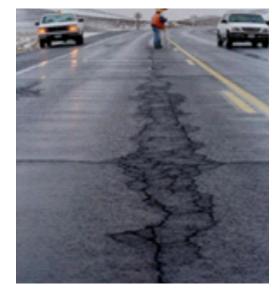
Fatigue cracking due to stripping in asphalt pavement
